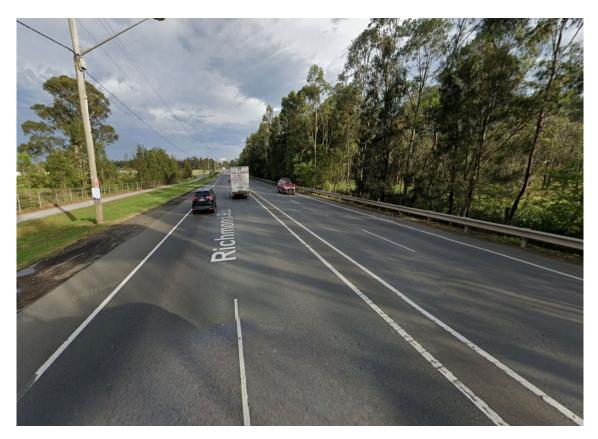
Existing viewpoint 6 - Richmond Road Bells Creek bridge crossing, looking north
